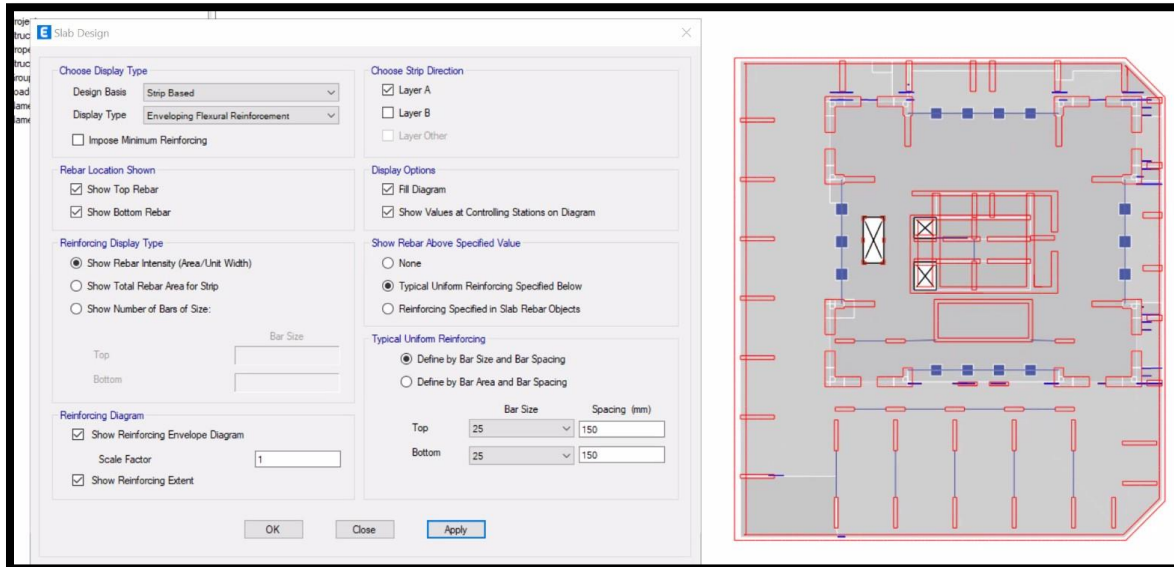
Reinforcement in X-Direction for Odd Zones in Ground Floor
